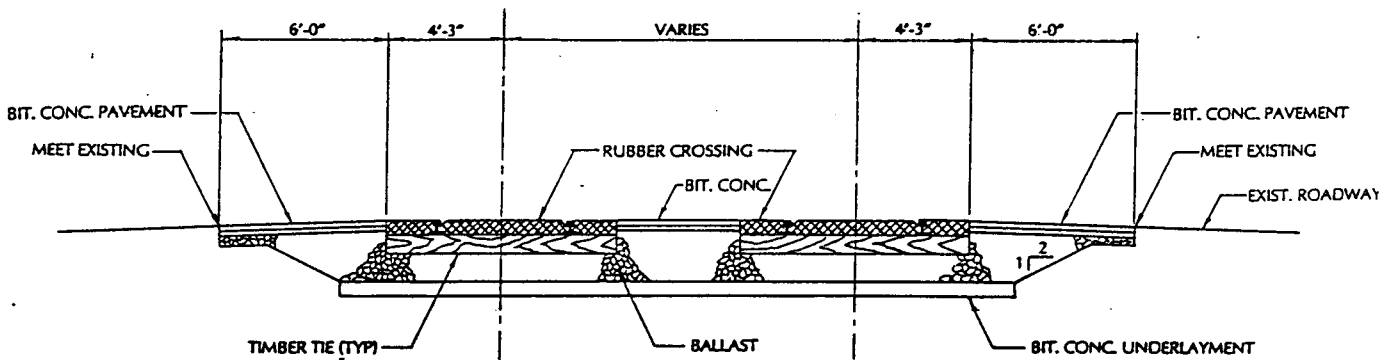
Rubber Grade Crossing Section at Intersection (A)
